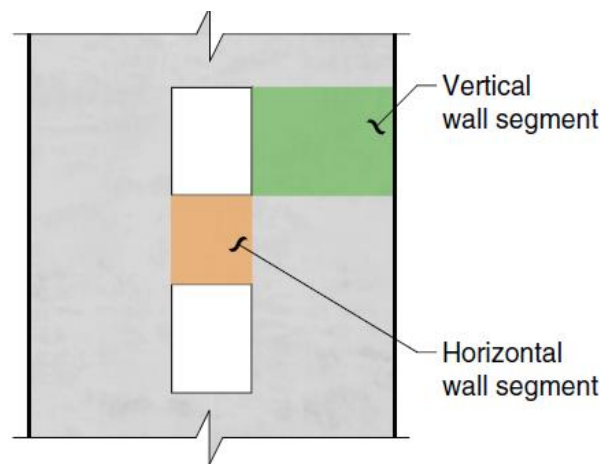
WALL WITH AN OPENING (ACI 318-19).
